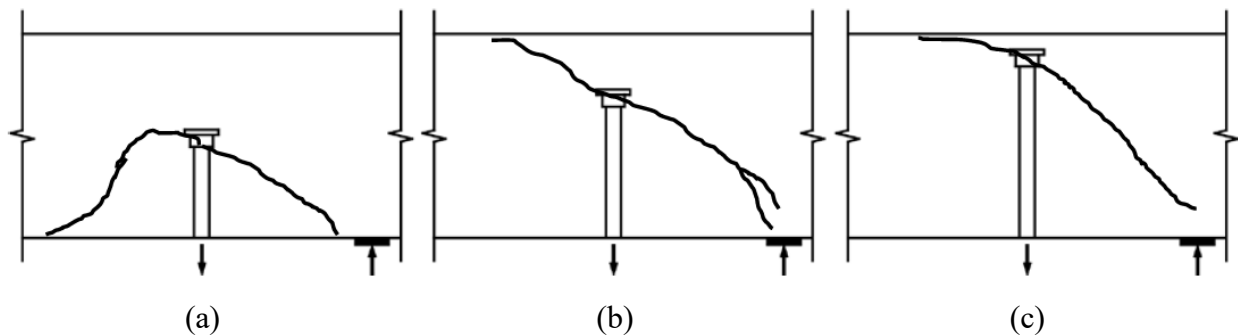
Failure modes: (a) concrete breakout, (b) and (c) joint shear failure (Chun et al. 2009)
